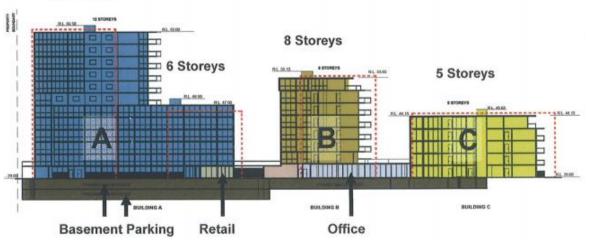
Concept Plan MP09_0029 Approved Building Envelopes
